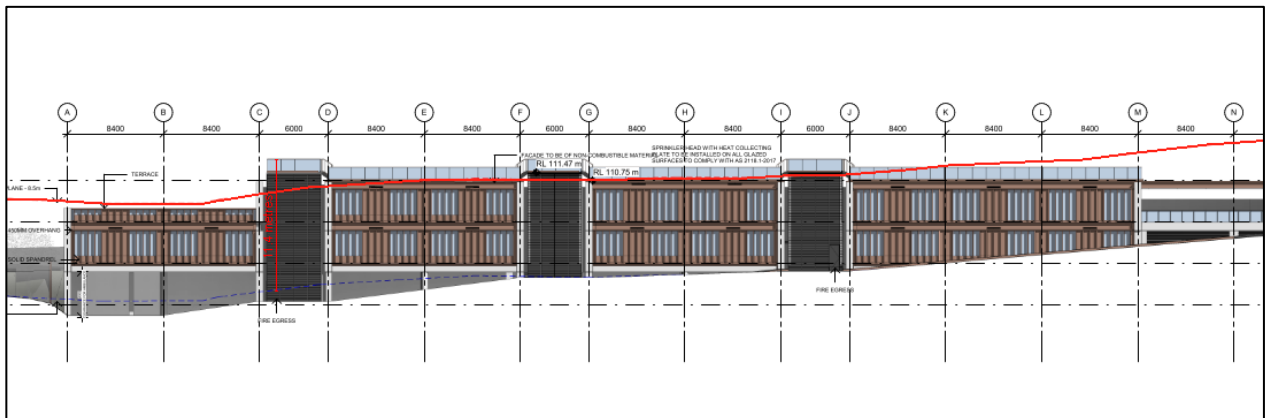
Revised South Elevation Plan depicting 8.5m building height plane.
